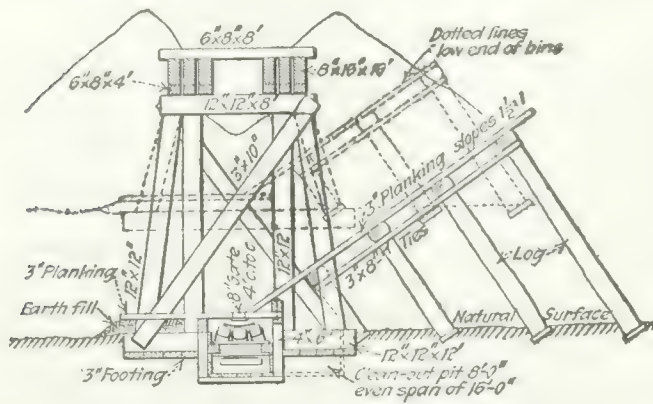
SECTION OF GRAVEL STOCKPILE TRESTLE
